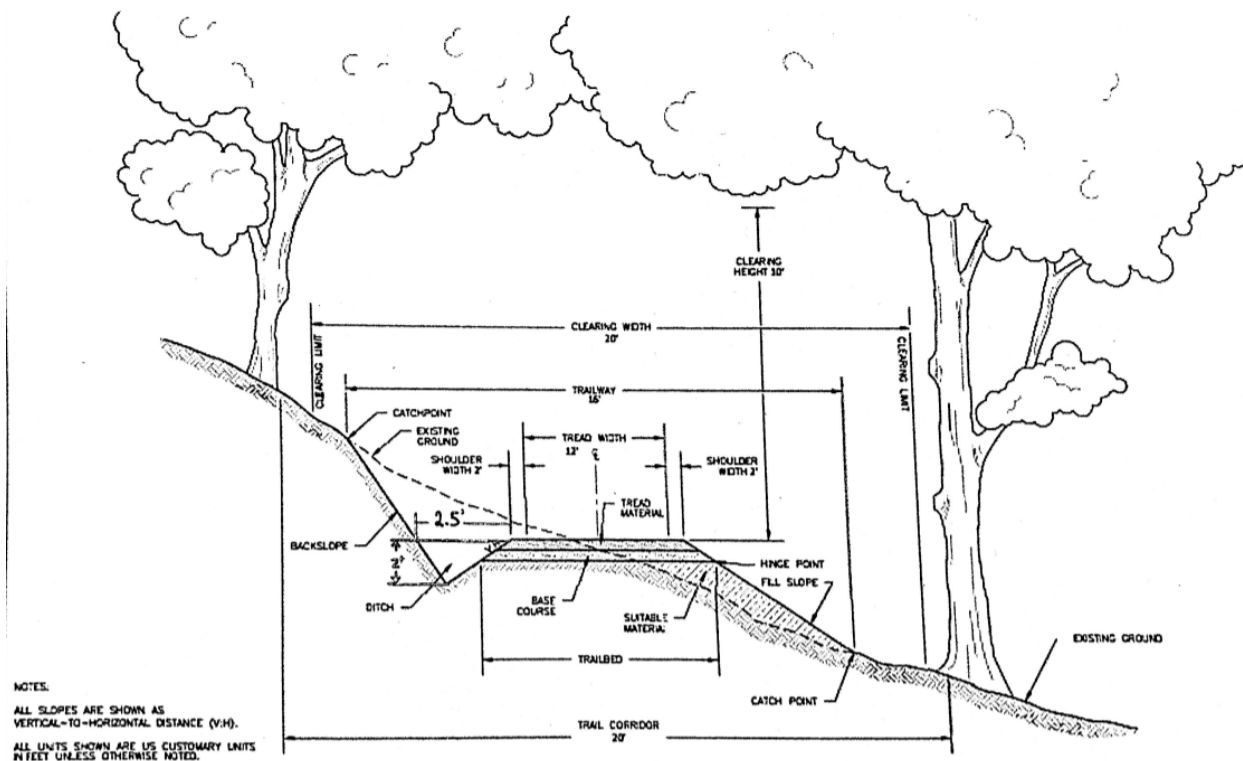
Heavy Stormwater Trail Cross Section (Modified from U.S. Department of Agriculture Forest Service)
